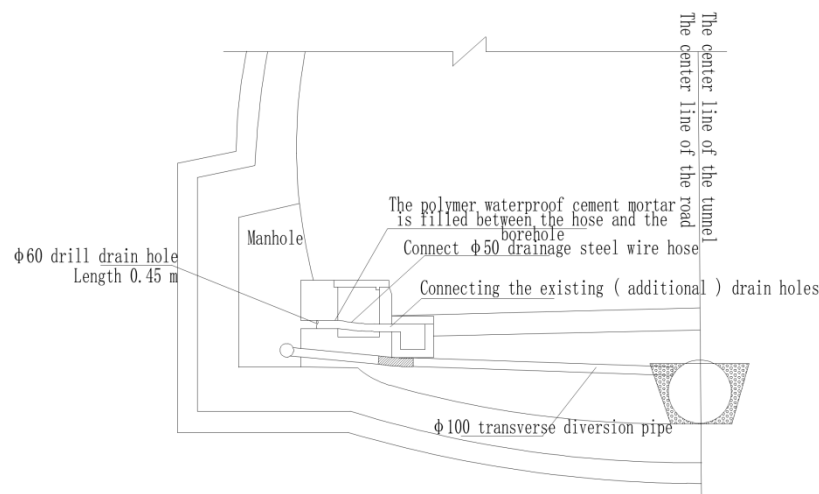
Design drawing of vertical drainage pipe inspection and well water treatment.
